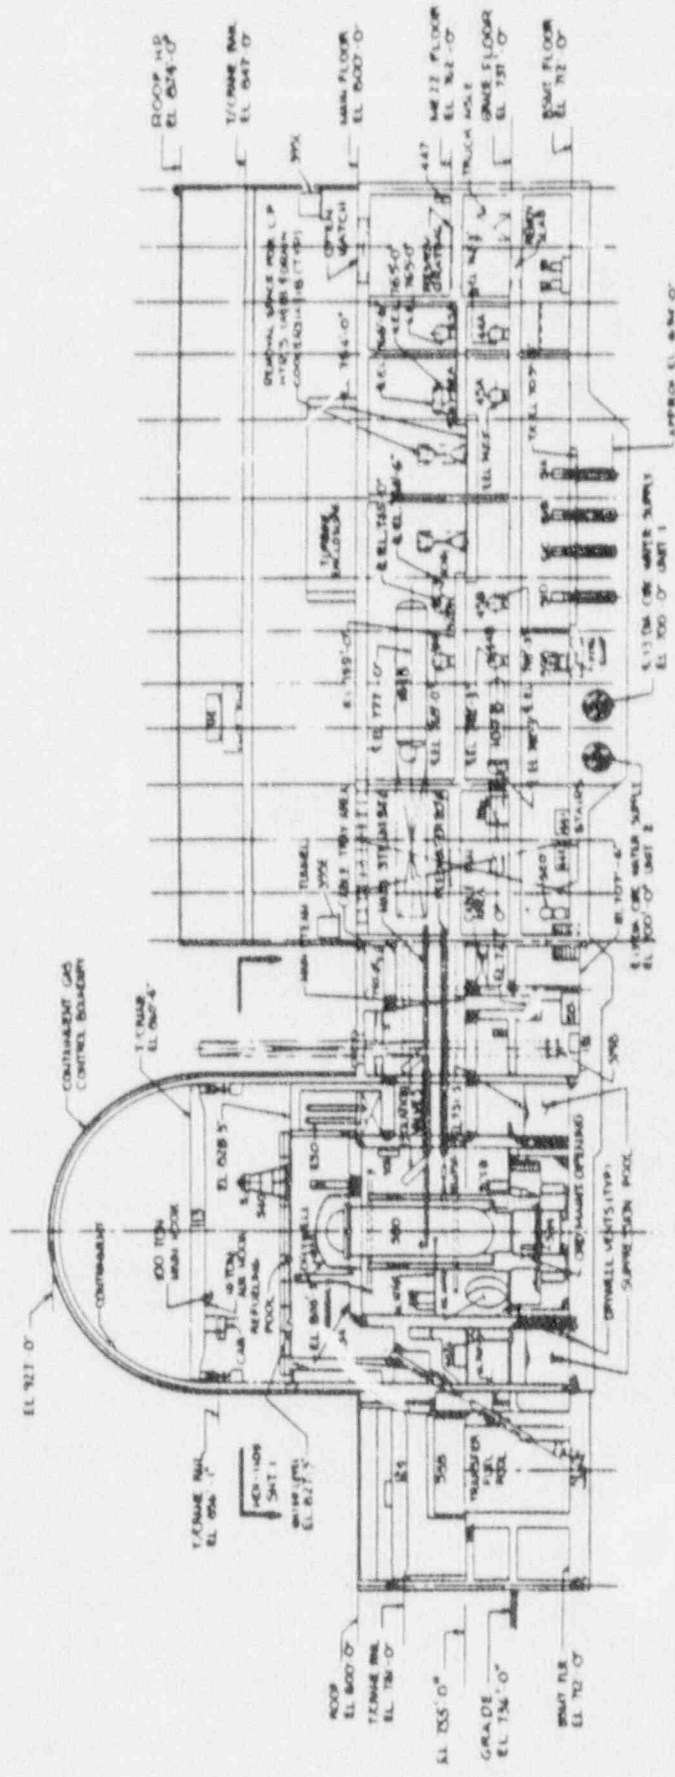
Longitudinal Elevation Views of Clinton 1 Showing Containment, Fuel, Auxiliary and Turbine Buildings (Page 1 of 3)
